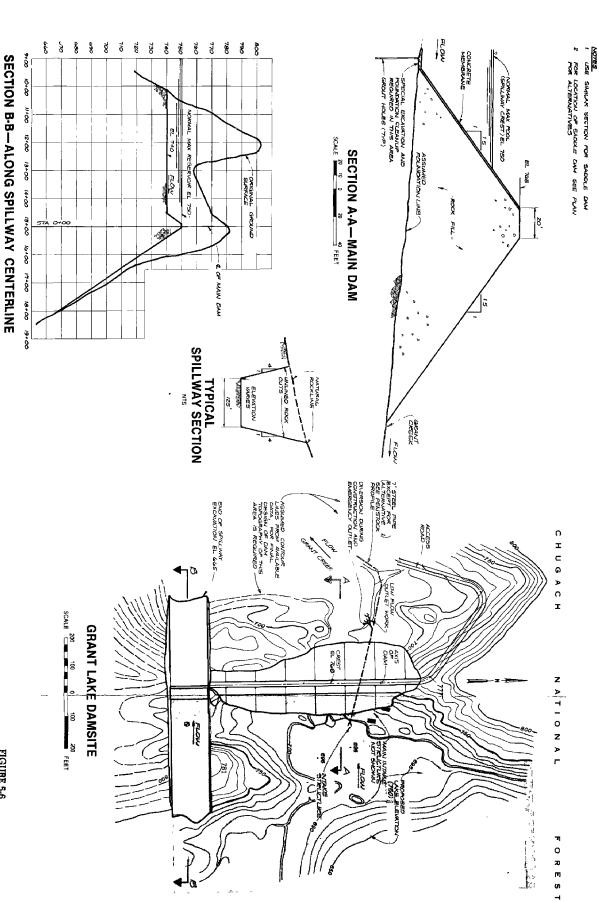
DETAIL OF DAM AND SPILLWAY
